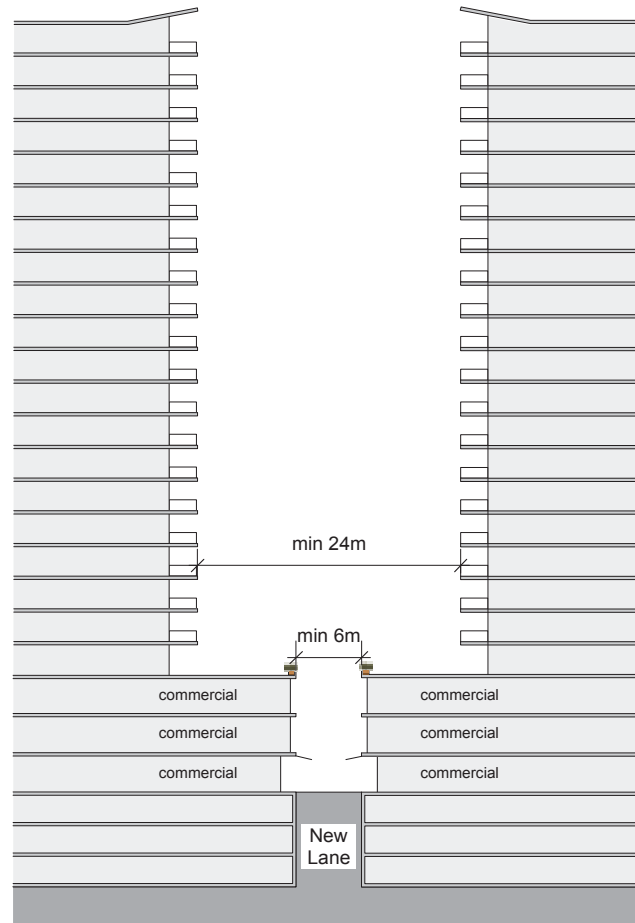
Setbacks to New Lane connecting Rawson Street to Beecroft Road
